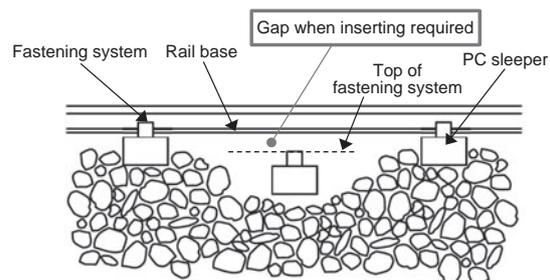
Positional Relationship of Parts when Inserting Sleeper
